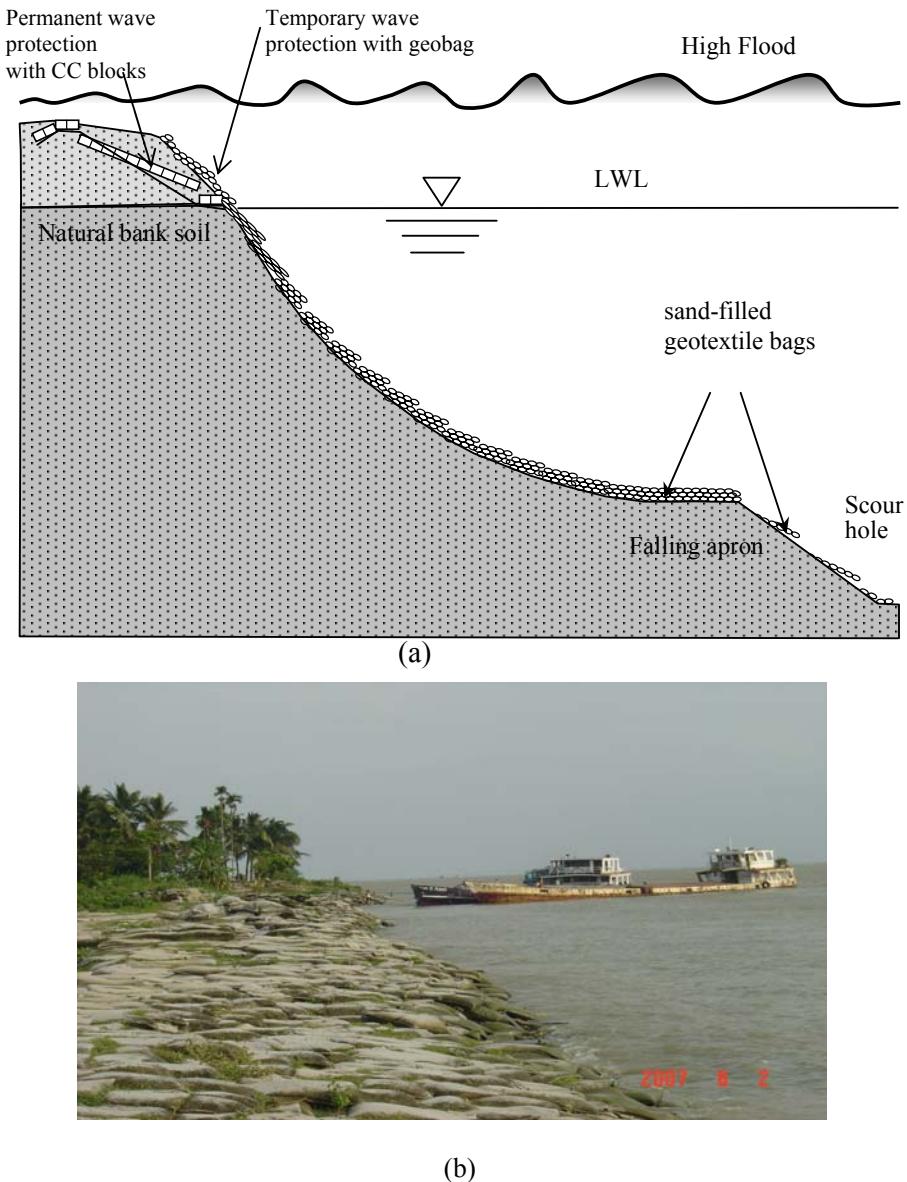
Geobag revetment (a) cross-section and (b) temporary protection
